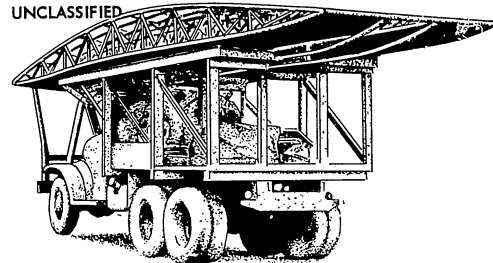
Unidentified Bowstring Truss Treadway Bridge. (U)
